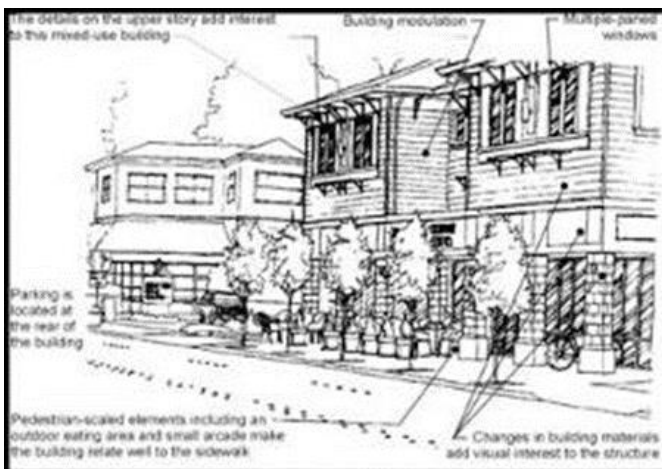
The use of different building materials, window treatments, and roofline brackets add to the visual interest of this building.
